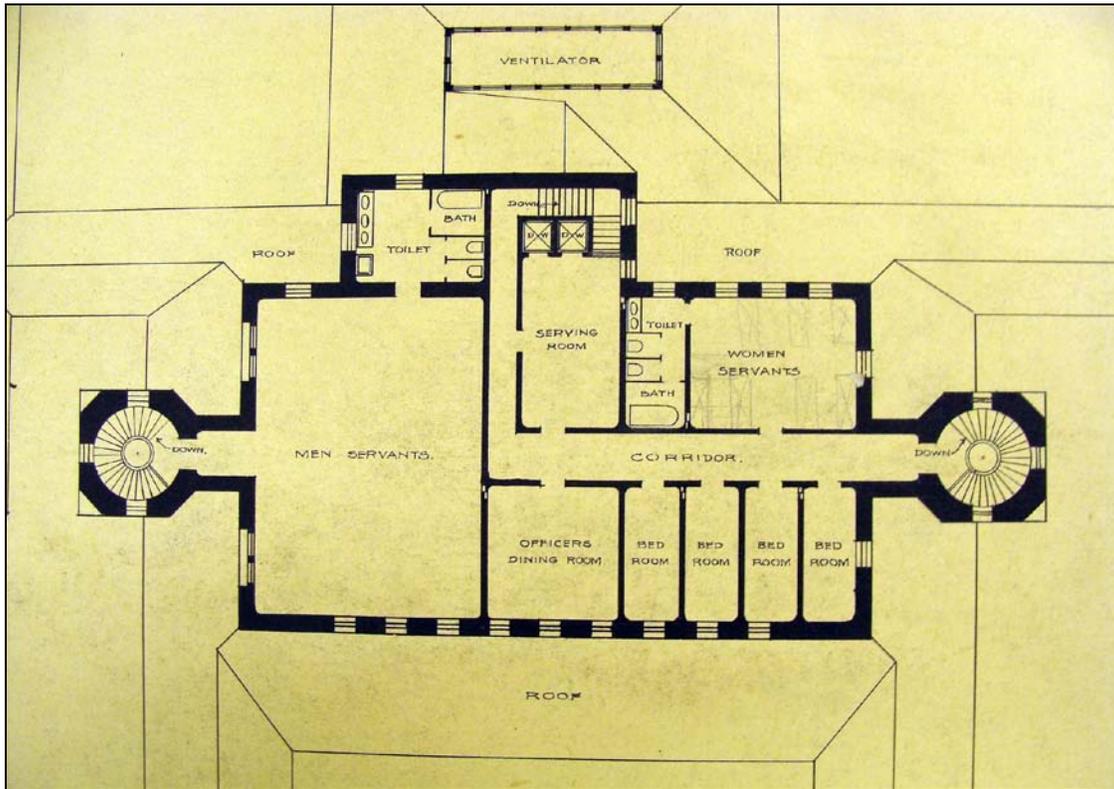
Excerpt of "Proposed Battle Mountain Sanitarium Second Floor Plan" showing Mess Hall/Service Building, Second Floor Plan, c. 1902
